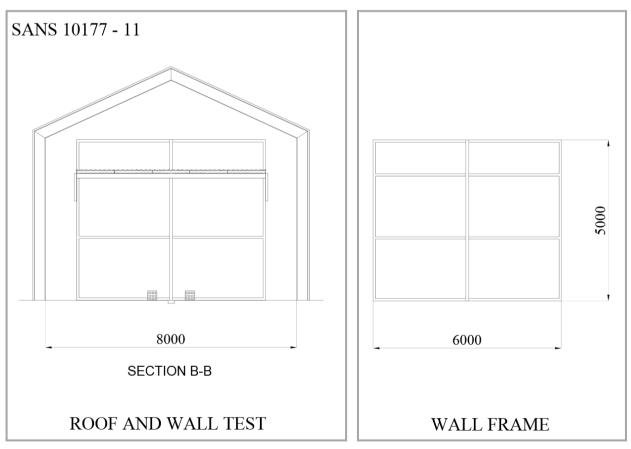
Typical side-cladding installation in SANS 10177-11 facility
